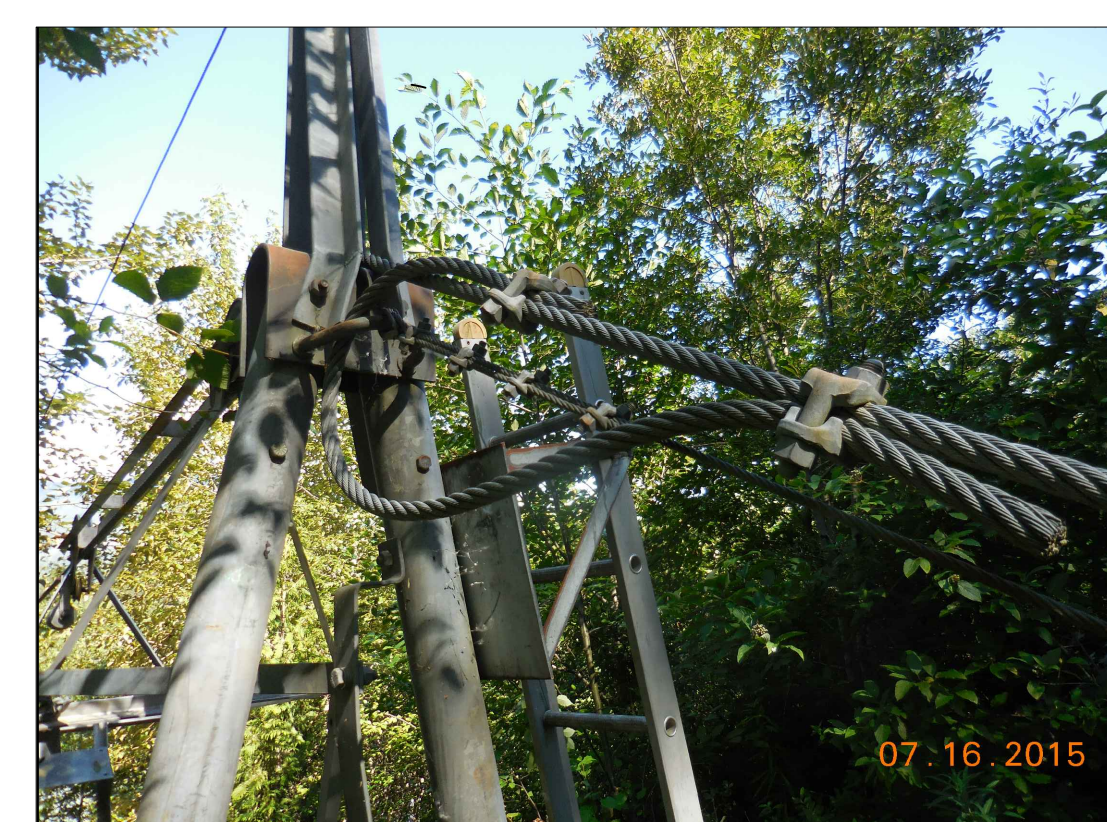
EXISTING SAFETY LOOP AND TIEBACK CABLE CONNECTIONS AT THE A-FRAME
